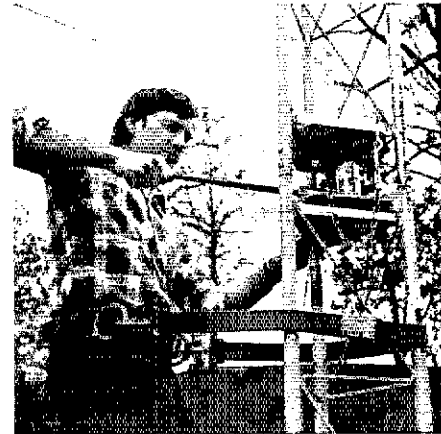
Upper tower section being jacked free. Note that the leg bolts must be removed. This photograph was taken for demonstrative purposes.
